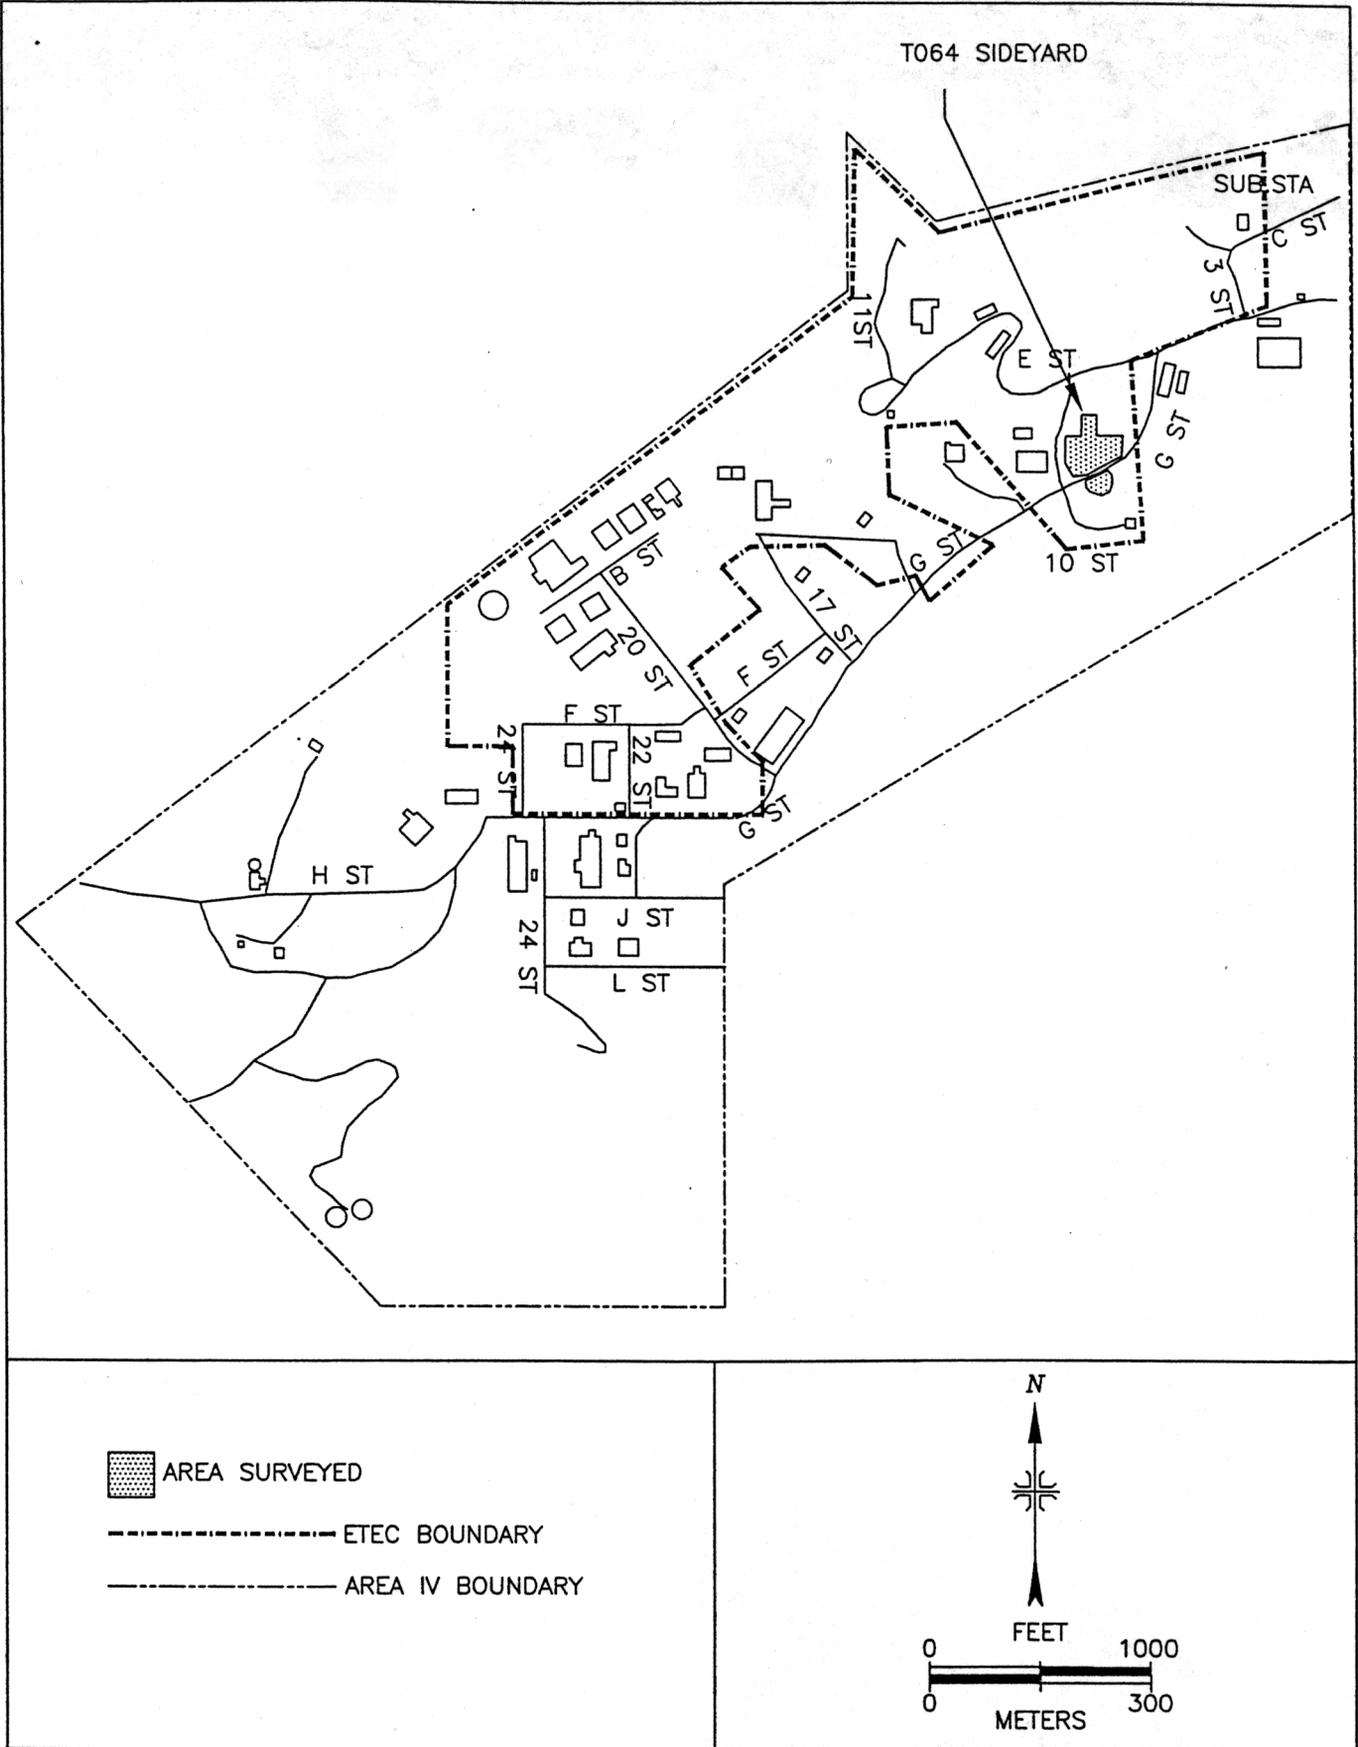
Santa Susana Field Laboratory Area IV, Plot Plan – Location of Building T064 Side Yard
